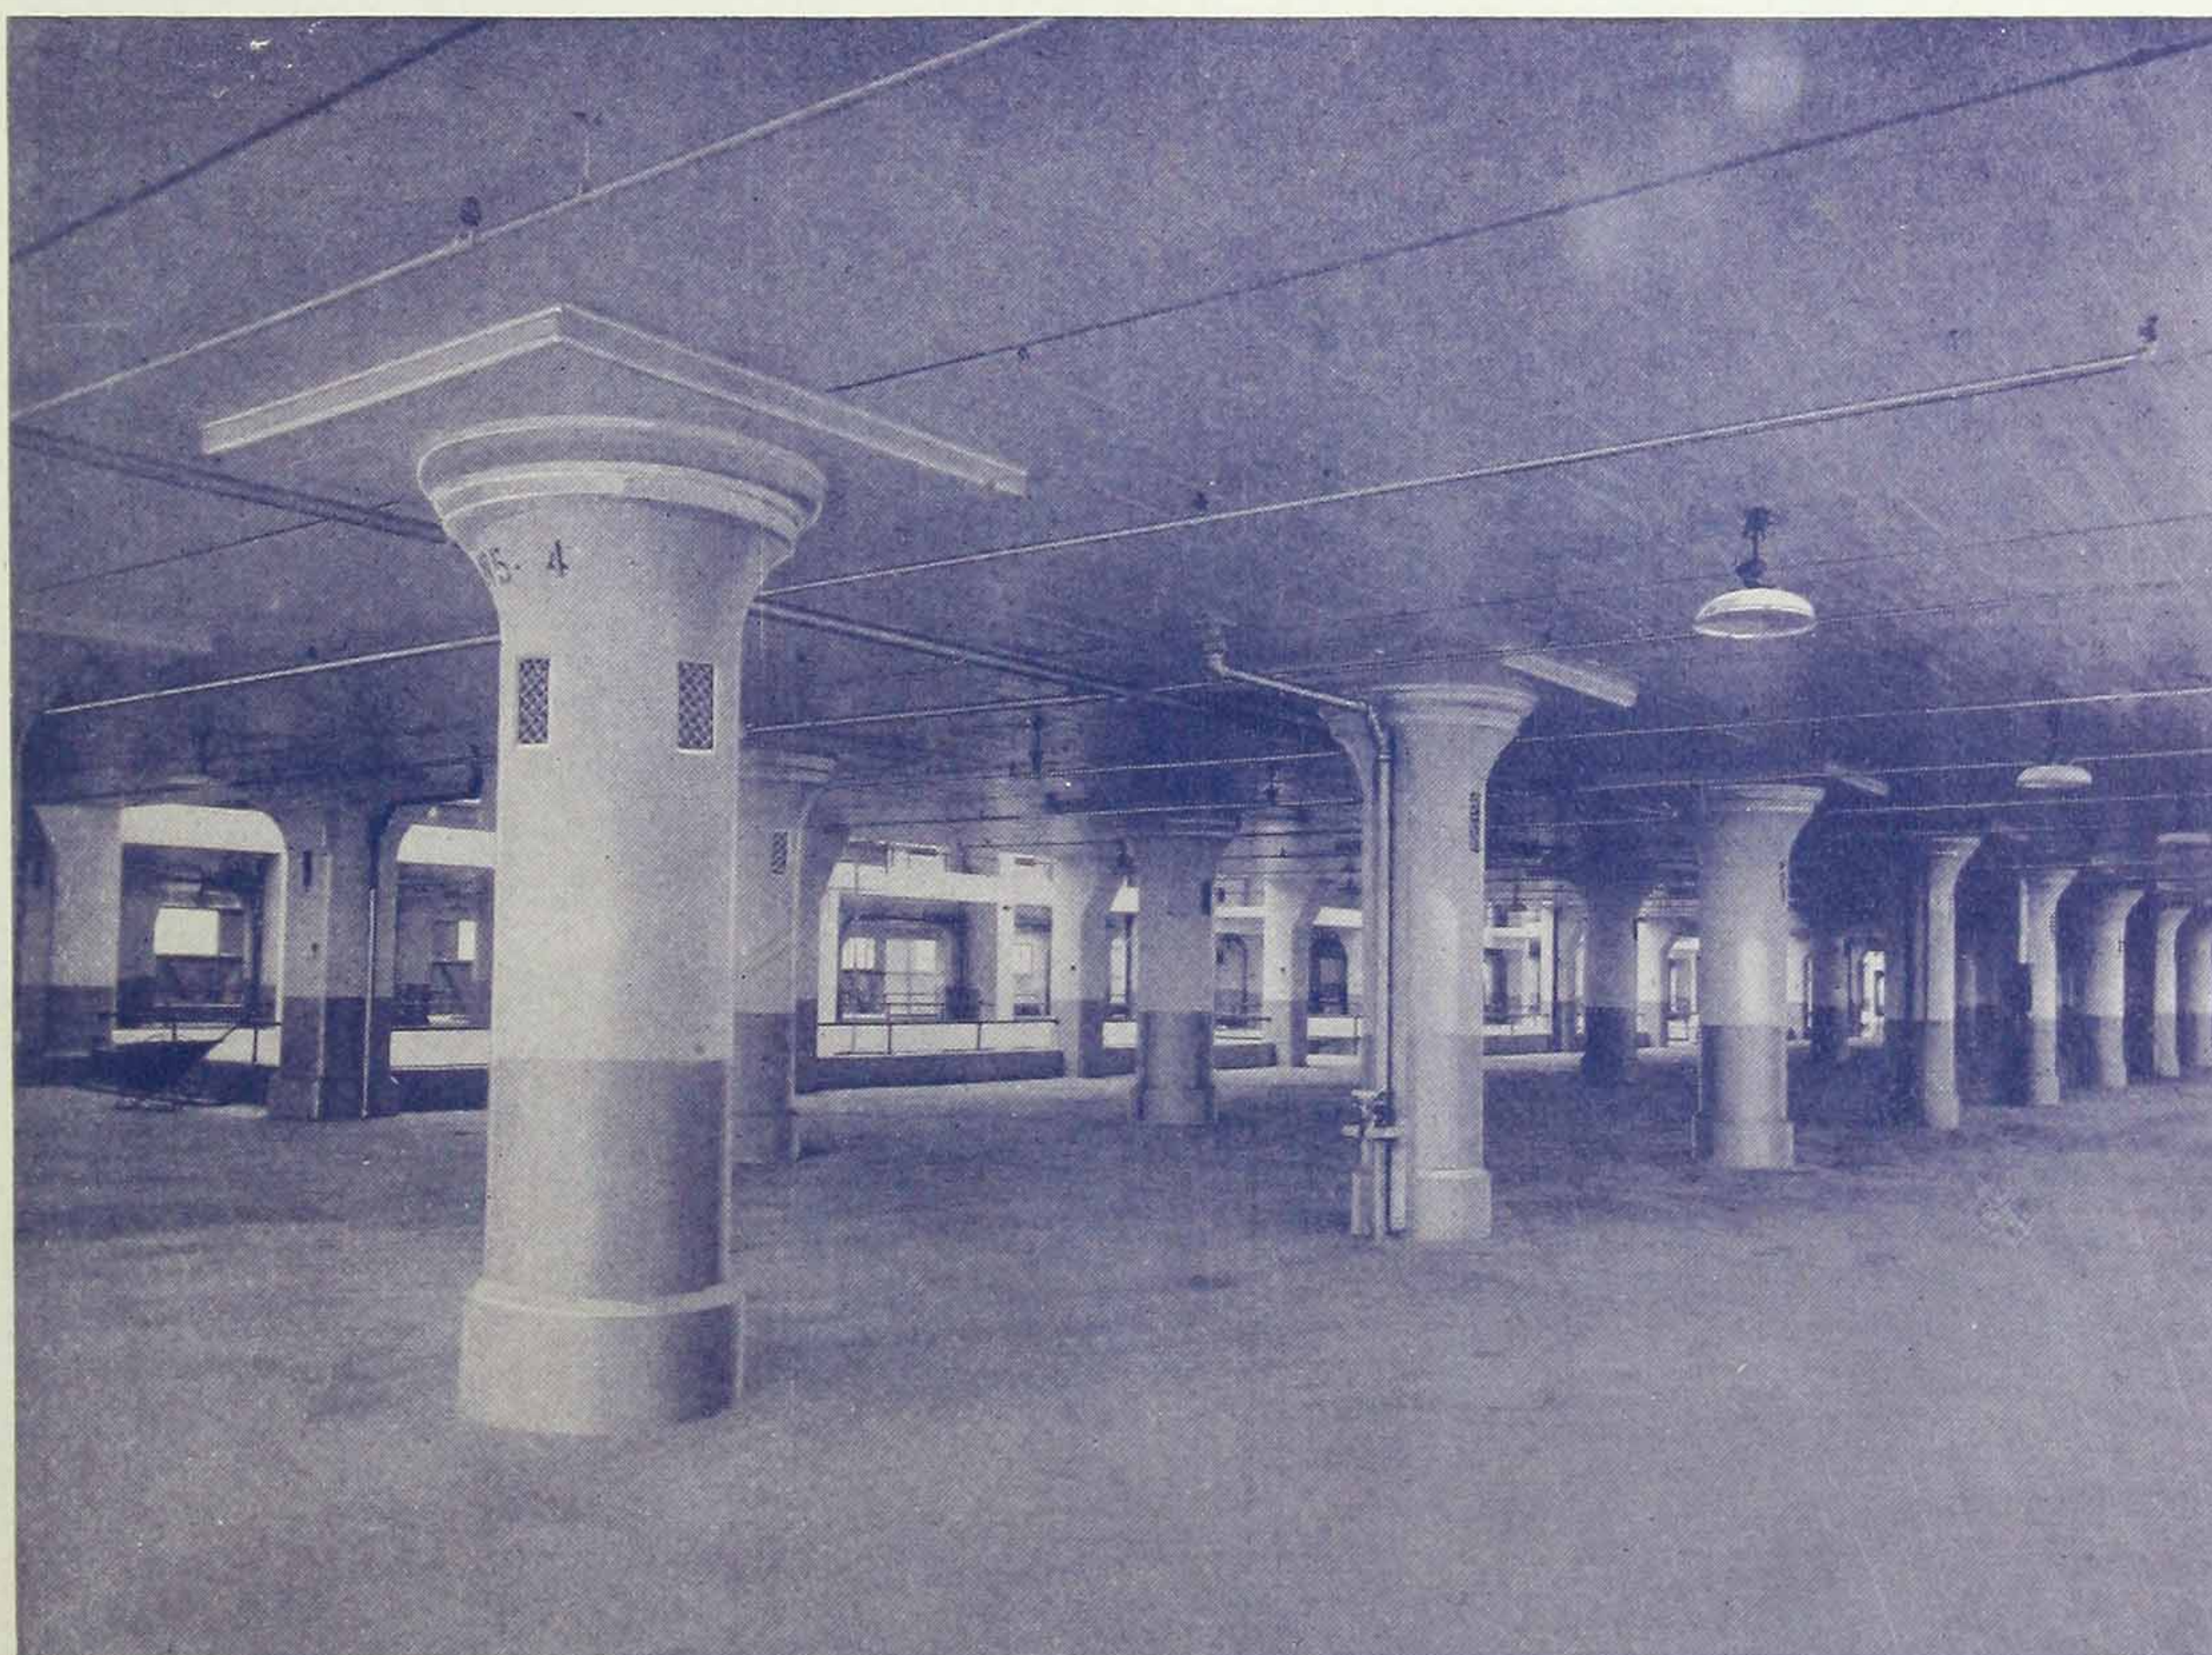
100 percent available floor space. View showing general details of columns, illustrating air outlets. The columns are hollow and were formed perfectly by filling the permanent sheet metal ducts with fine dry sand until the concrete hardened.
